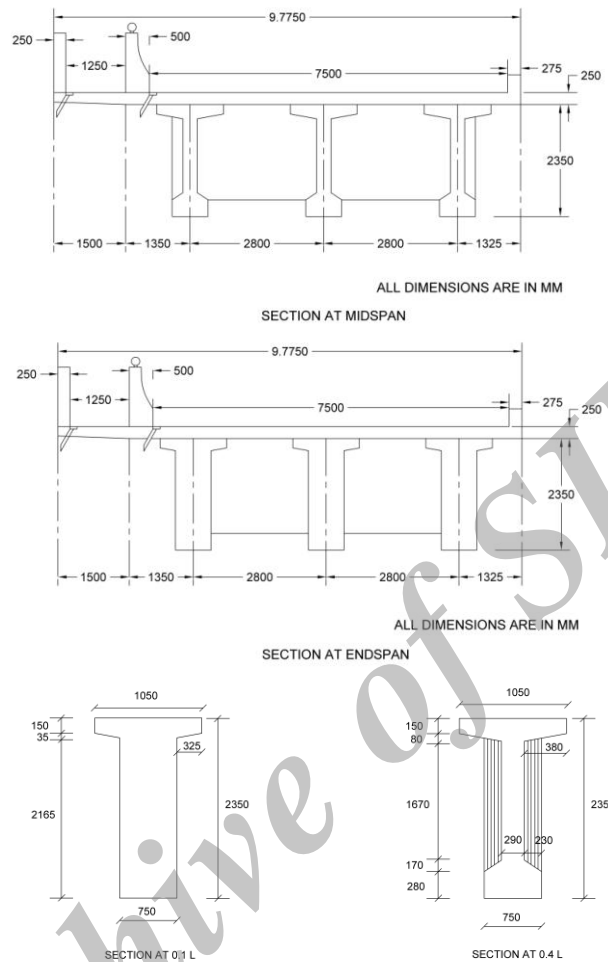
Geometrical sections of structural elements of Sabarmati Bridge
